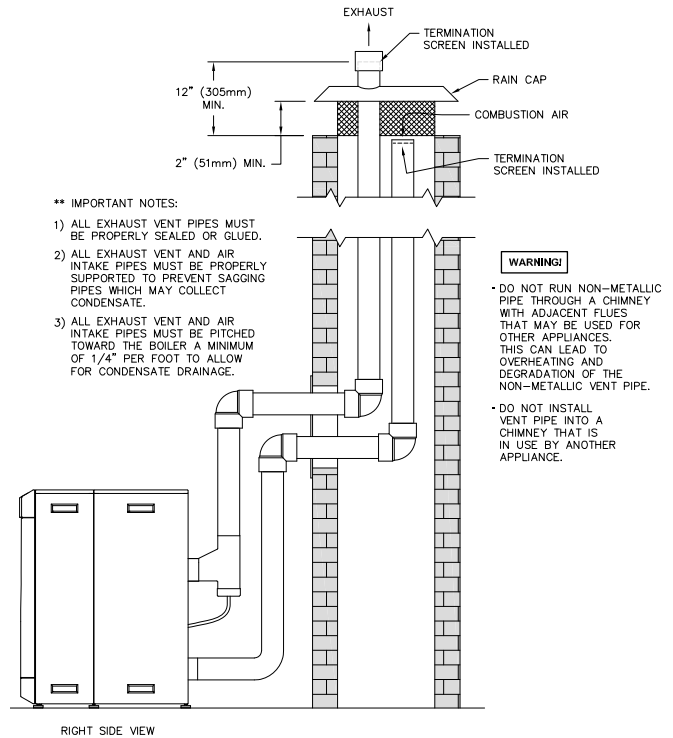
Vertical Exhaust Routed Through an Unused Chimney with Outdoor Air
